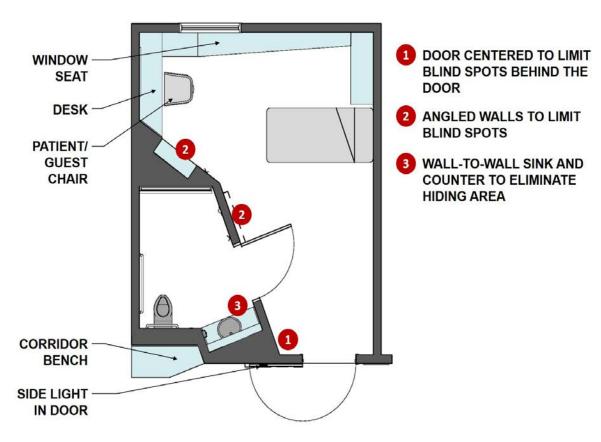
Provide clear lines of sight to the Patient Toilet/Shower to enhance staff observation without disturbing the patient. Swing doors are used and should swing out to prevent barricading.
